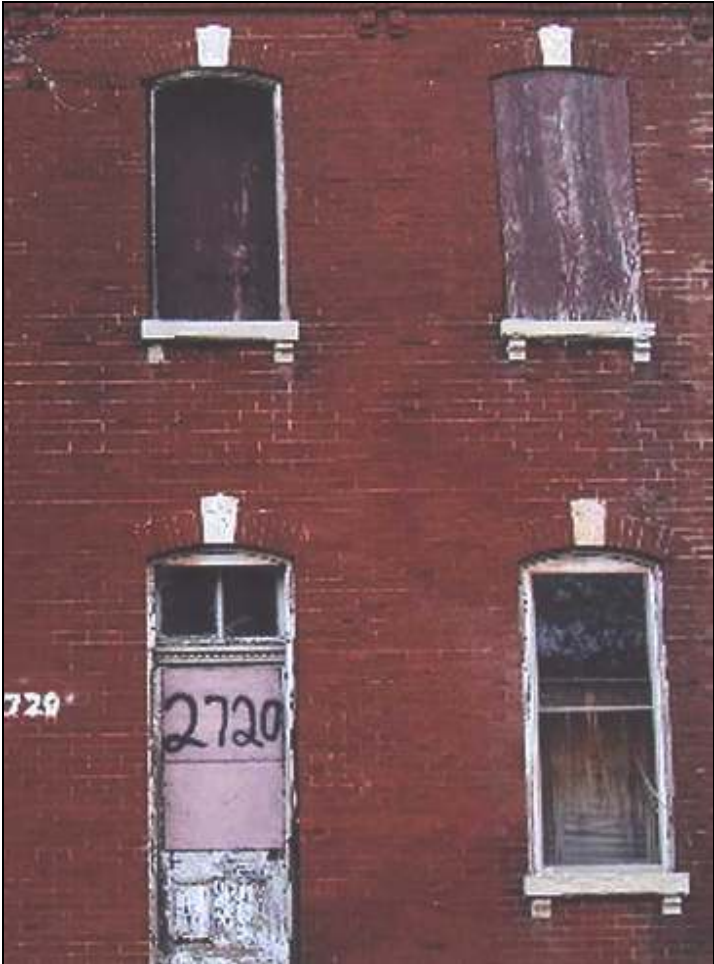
PHOTO SHOWING ORIGINAL SEGMENTAL ARCHED BRICKMOLD – EYEBROWS ADDED LATER TO INCORPORATE NEW WINDOWS OR STORMS
